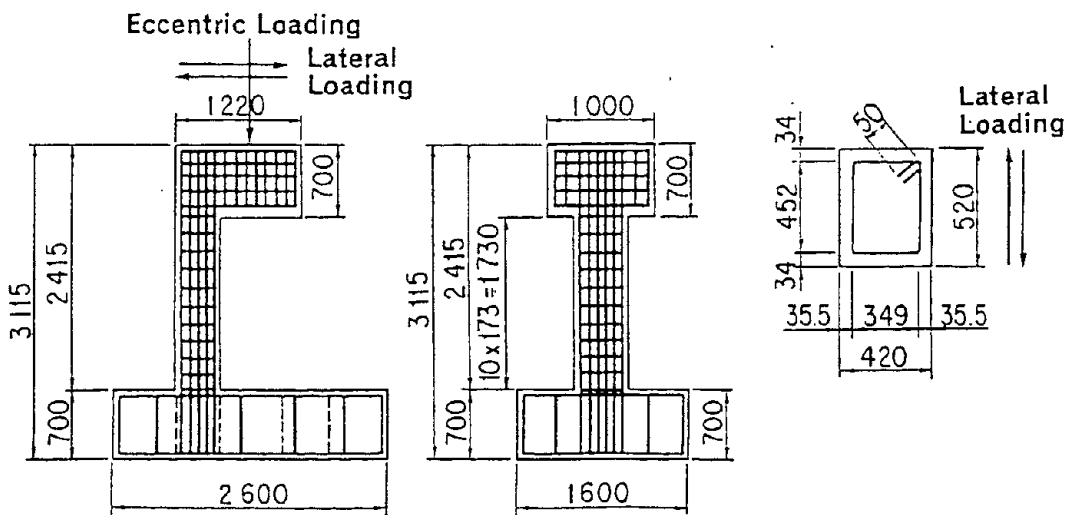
C-Shaped Bridge Pier Model for Shaking Table Test
